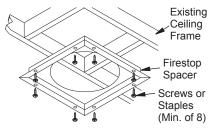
Firestop Spacer with Living Space Above Ceiling
